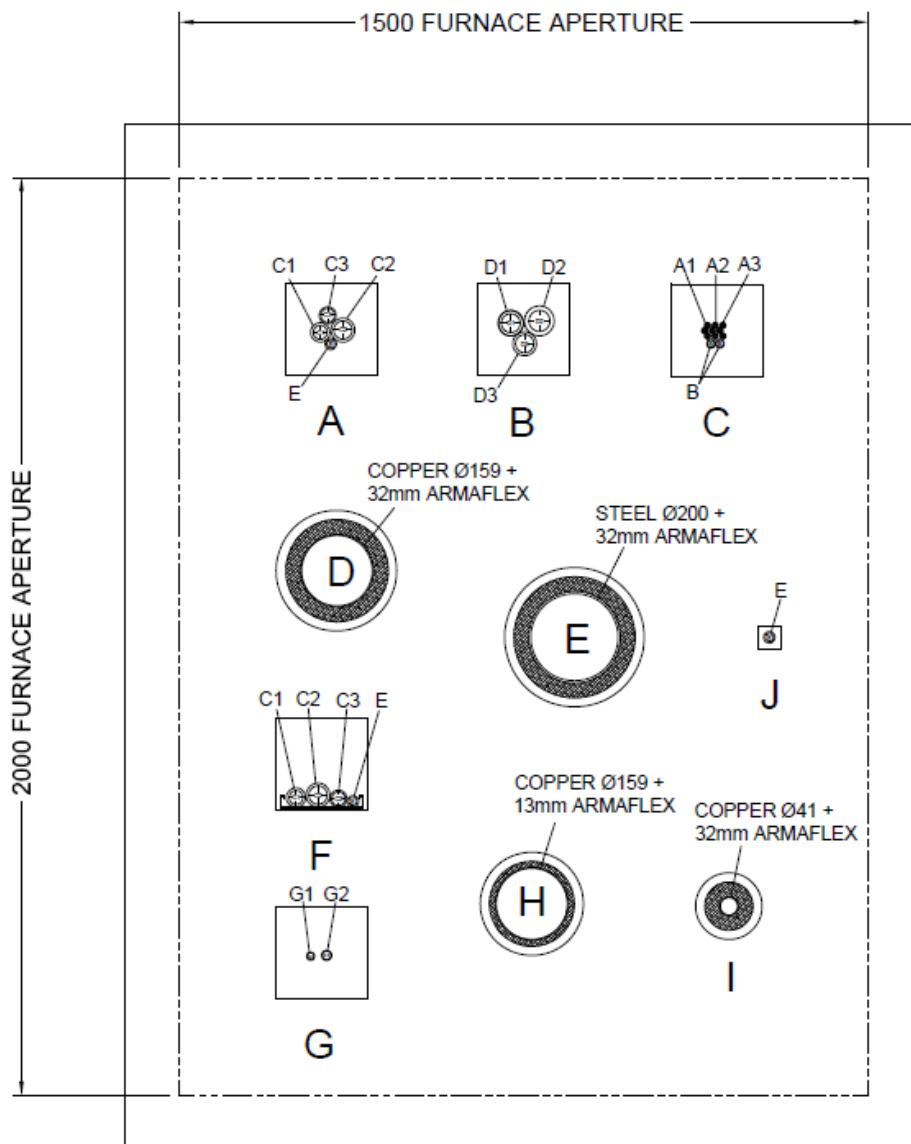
Plan of the unexposed face showing the aperture positions in a concrete floor
